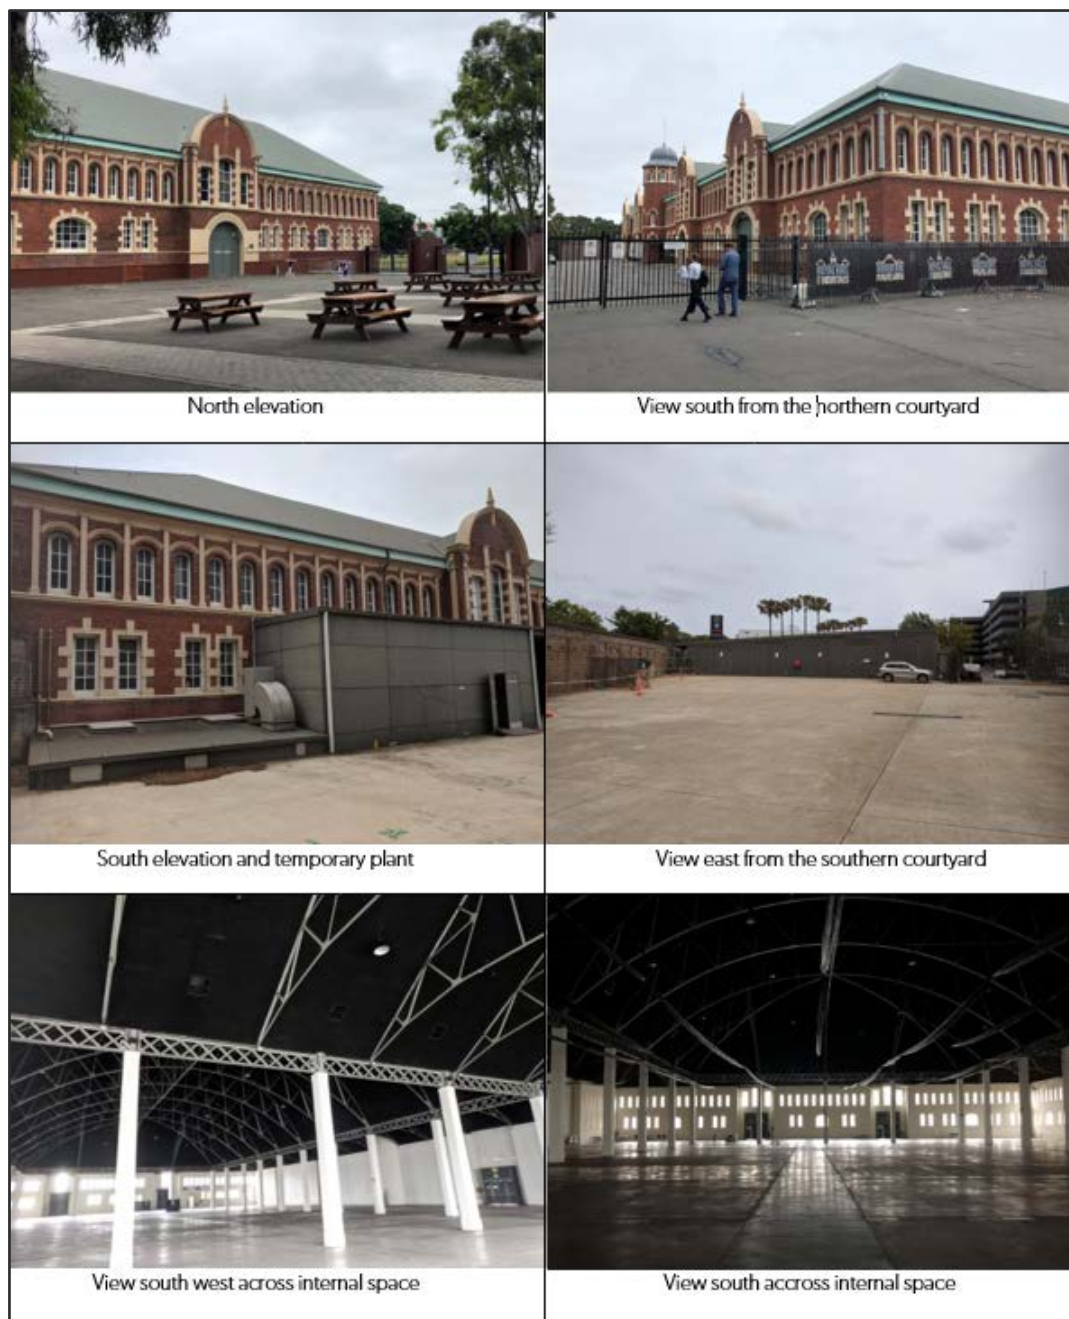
| Existing internal and external condition of the RHI: (Source: DPIE site photos).
